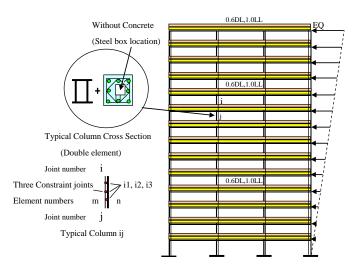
Typical steel frame (with or without "X" bracing) with composite columns
